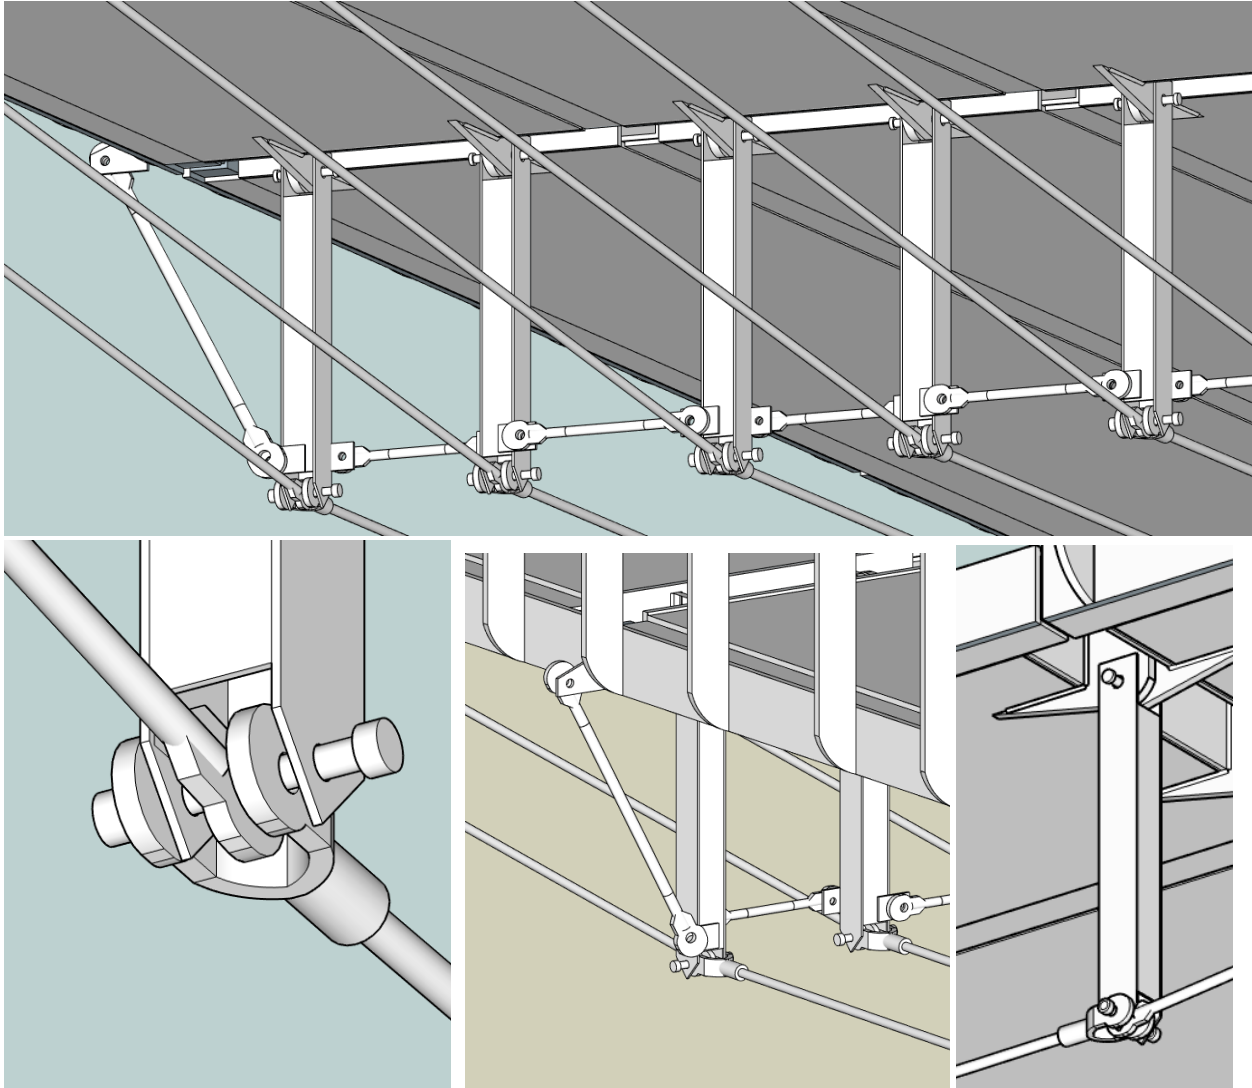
Overview of the bracing system (top), connection tested for shear and bearing resistance (left), end bracing element connected to the railing (middle), and connection between struts and transverse connection without bracing (right)
